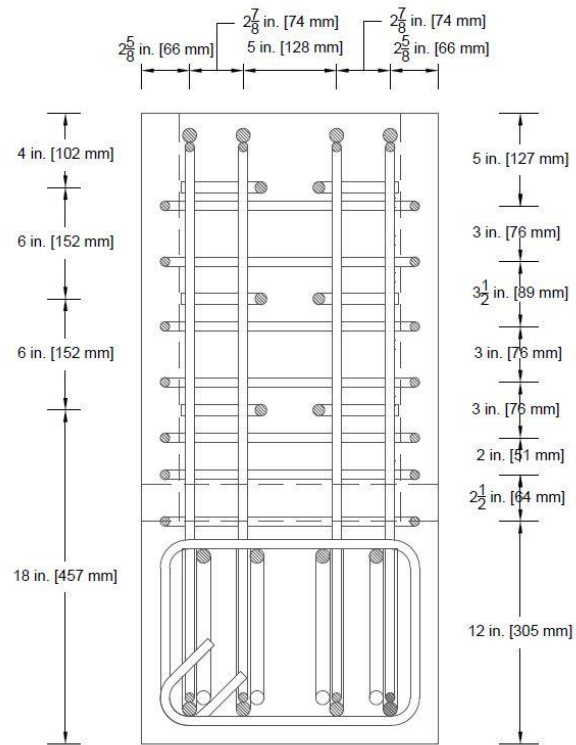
Section A-A steel layout for a specimen containing three #4 U-bars spaced at 6 in. (152 mm).
